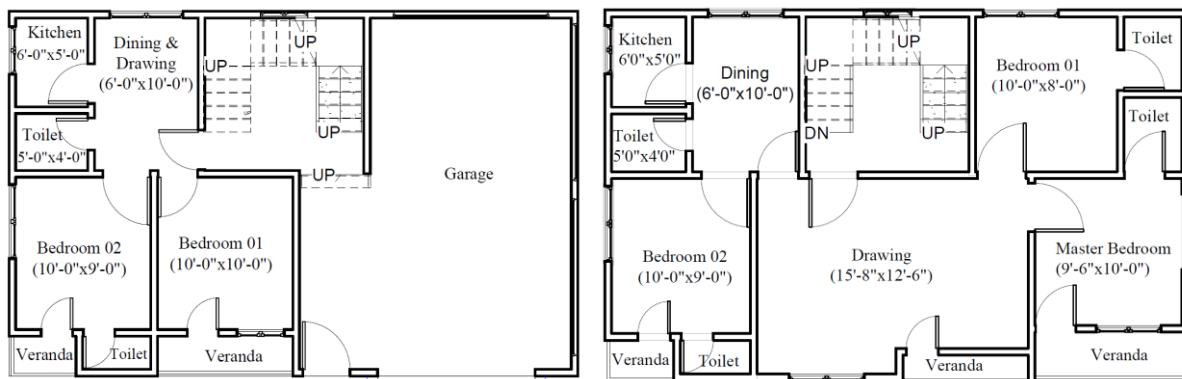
(a) Ground floor layout & (b) 1<sup>st</sup> & 2<sup>nd</sup> floor layout
